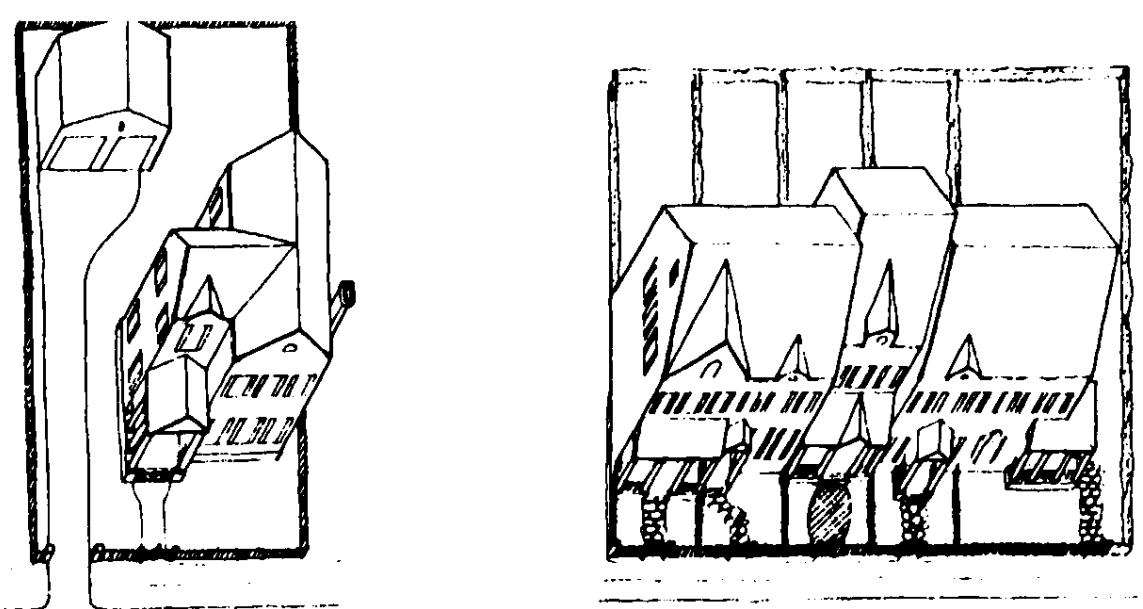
All dwelling units shall have a private yard, patio or upper-floor terrace.
